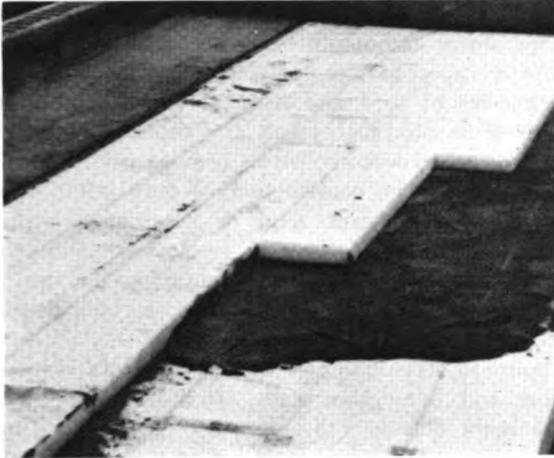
Expanded polystyrene boards on roof construction; top layer forms a "sandwich".
